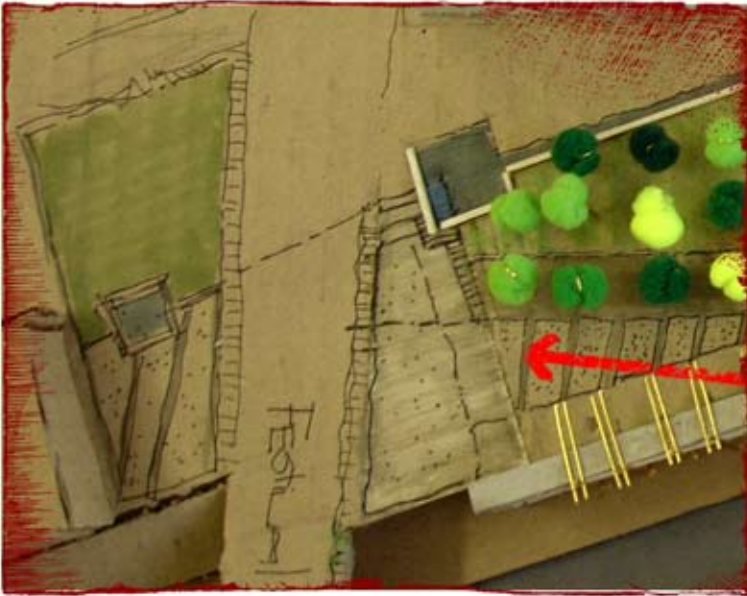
Urban green pocket across the bridge connecting to proposed urban space at Rissik station intervention
